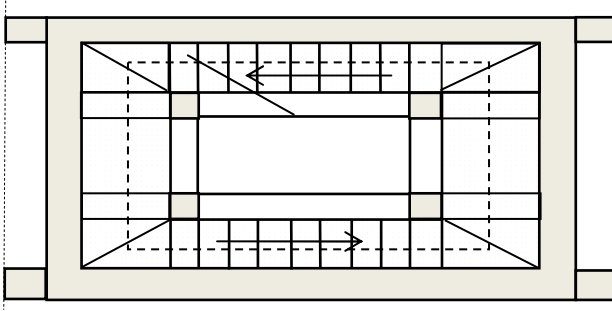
Brick layout of a typical cantilevered stairway (Formenti 1893).
